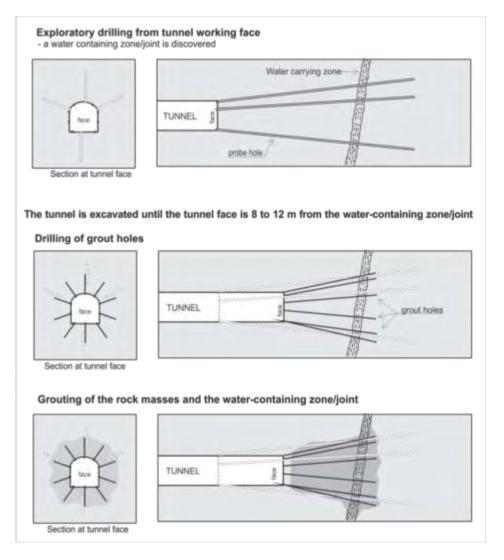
Principles of probe drilling and pre-grouting. Typical length of probe drilling holes is 25-30 m, and the overlap is typically about 5 m.
